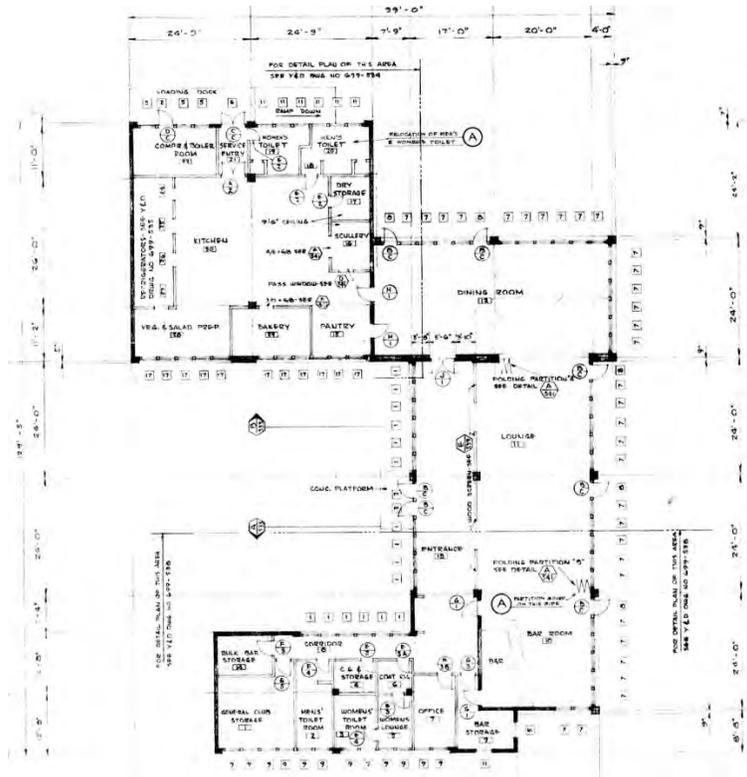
As Built plan view of Feature 124, NTTU mess/club building.
